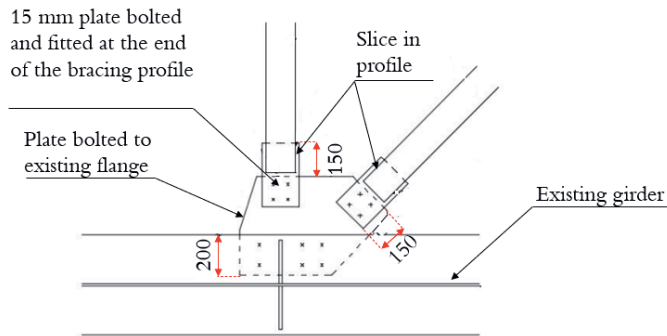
One solution to attach the bracing members of a K-shaped bracing.
